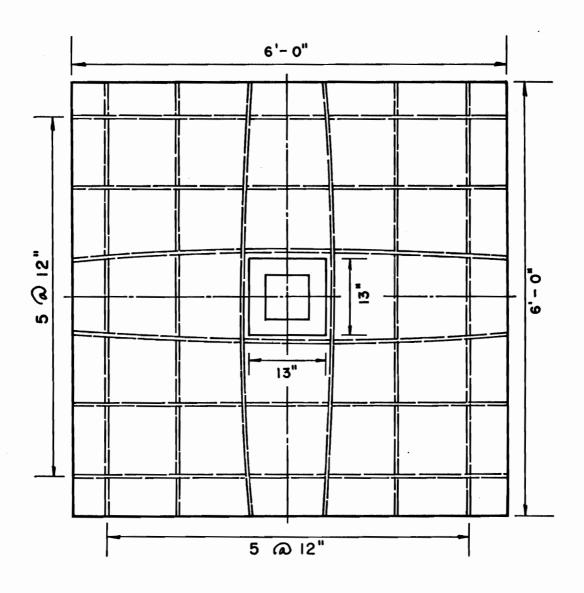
LAYOUT OF PRESTRESSED CONCRETE LIFT SLABS
